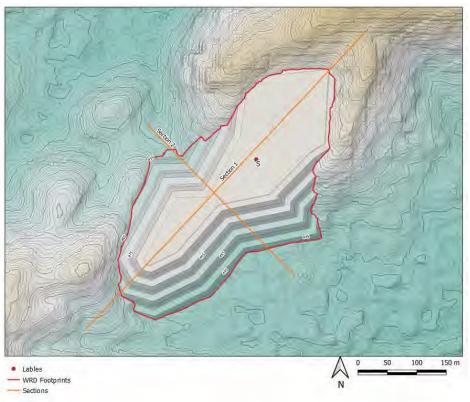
Waste Rock Dump (South) Cross Section Example (ATC Williams, 2022)
